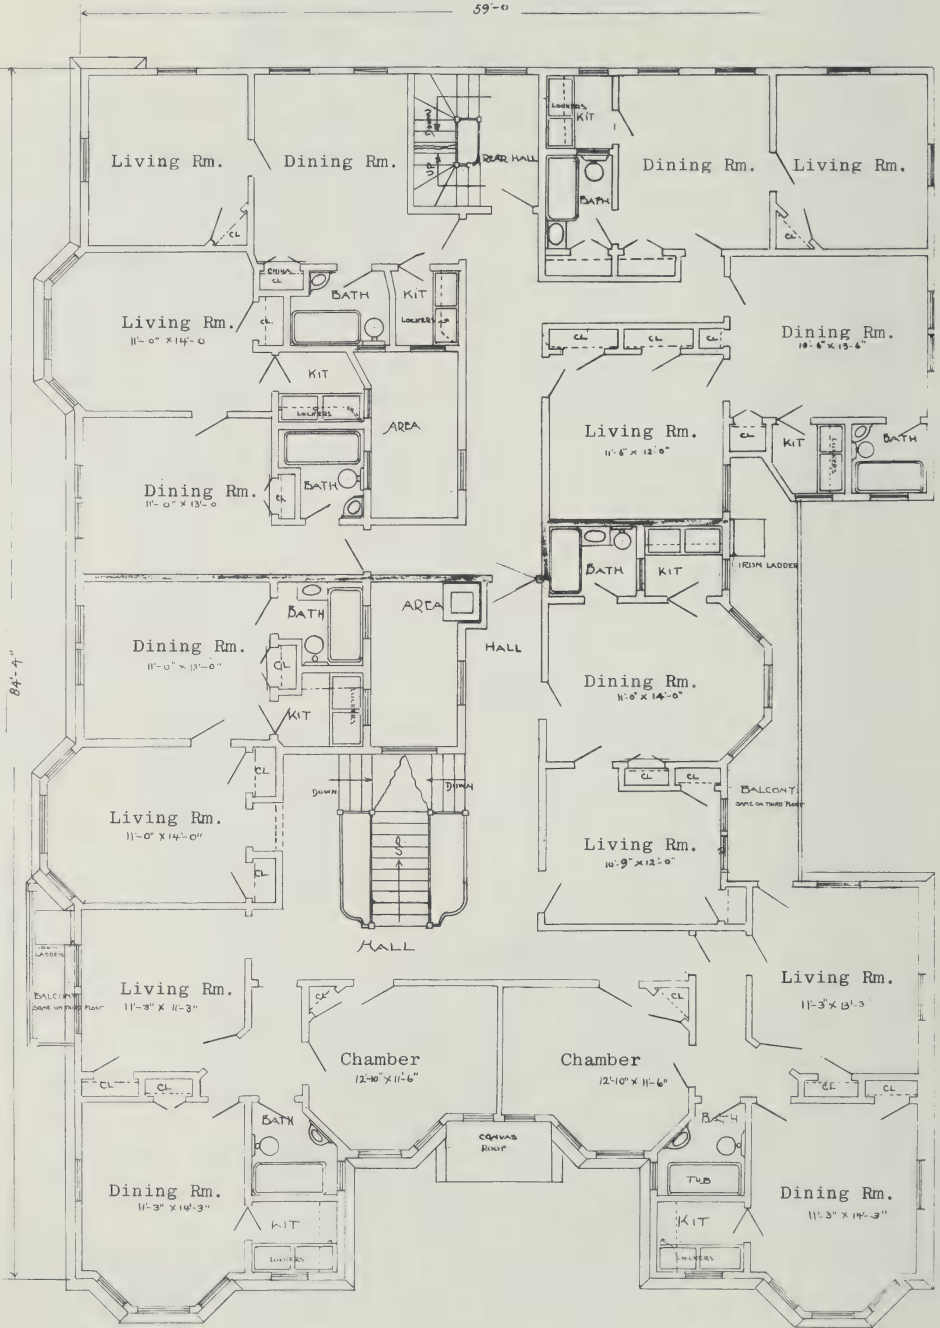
Plan for the second floor of 172 Washington Street, an apartment building built in 1909. Presumably living rooms and/or dining rooms doubled as bedrooms. Plan courtesy of the Building Department of the City of Lynn.
